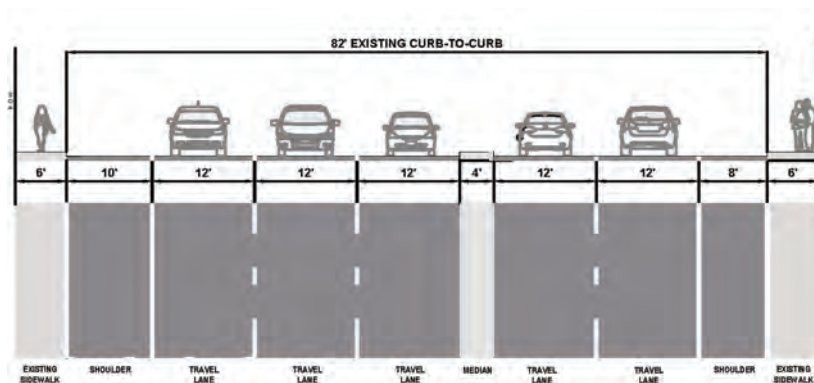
San Bruno Ave Existing Typical Section Over US 101 Overcrossing (Facing East)
